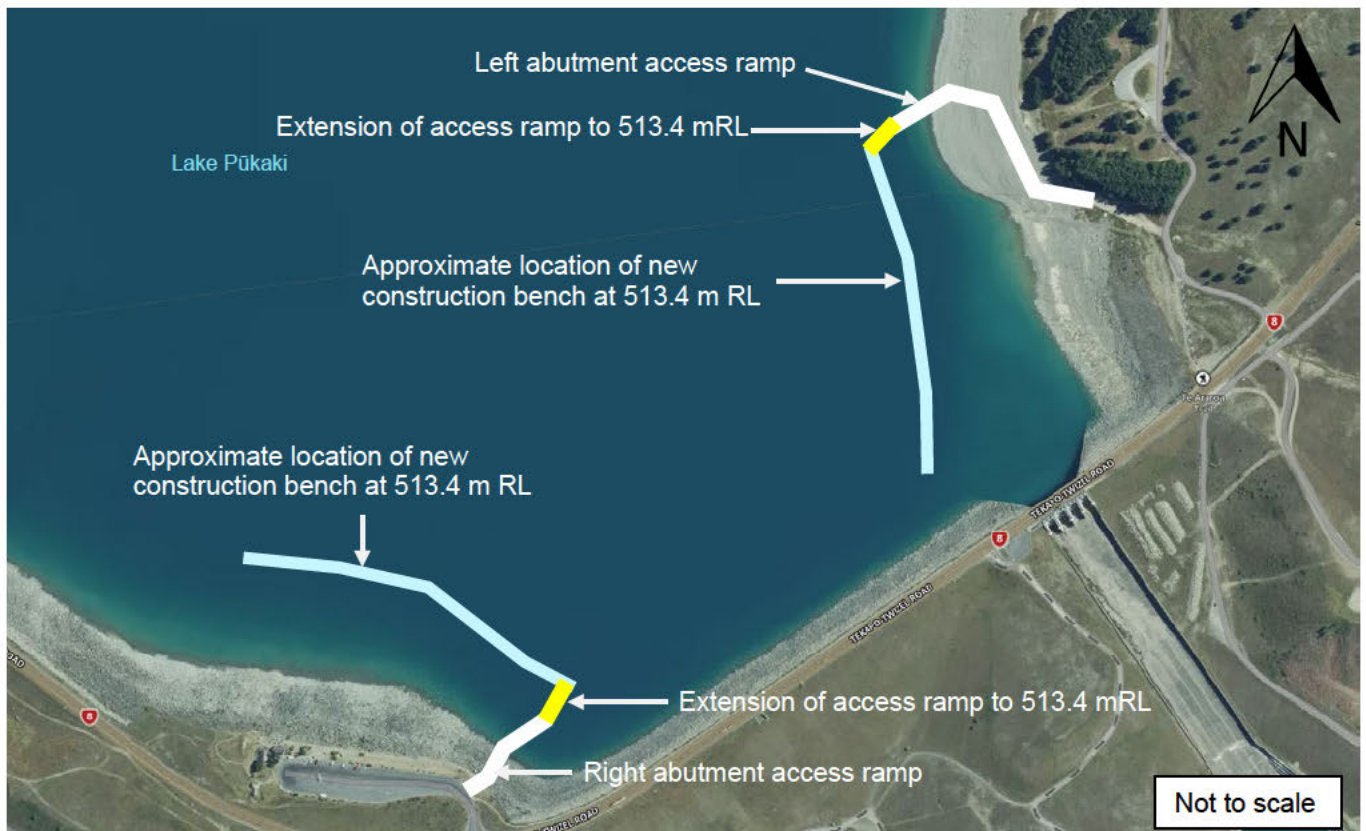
Site plan (abutments) and indicative 513.4 m RL construction bench
